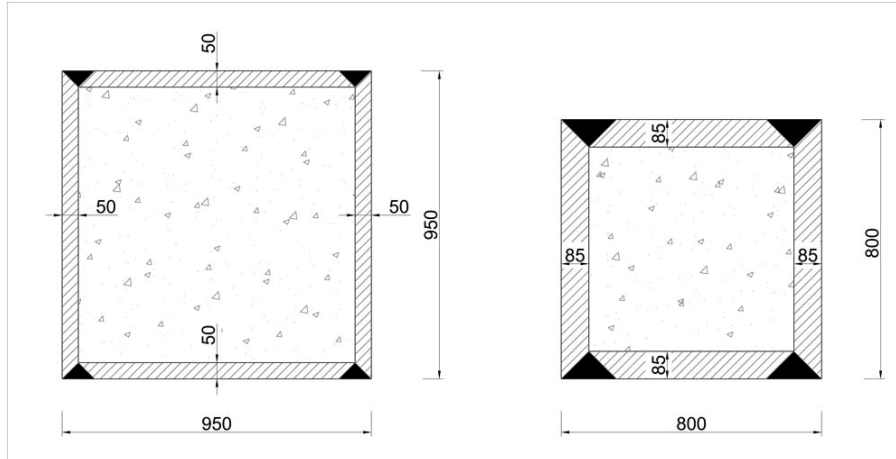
(a) Concrete filled rectangular steel tube; (b) Smaller size concrete filled rectangular steel tube
